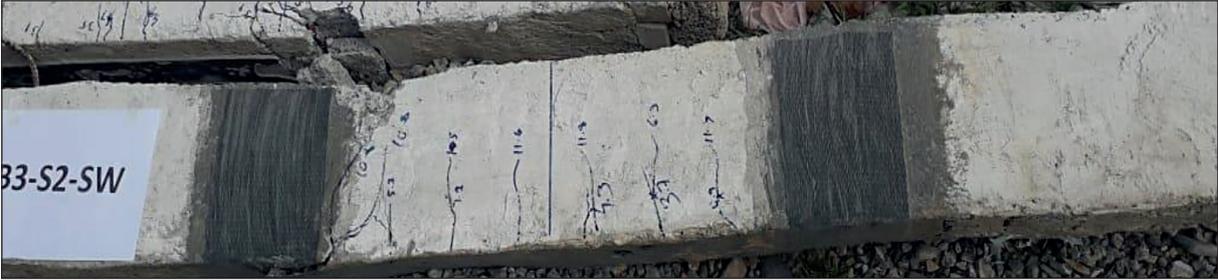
Final crack pattern of specimen B4 (strengthened with CFRP wraps)
